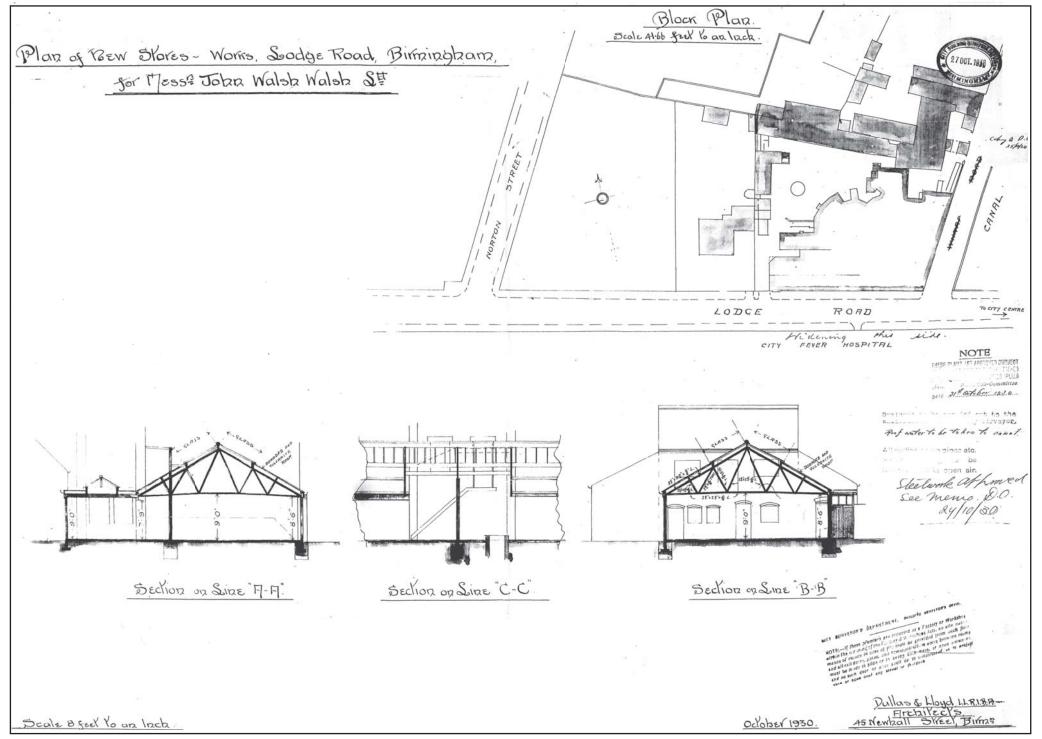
Design Drawings for Building K: Block Plan and Sections October 1930
